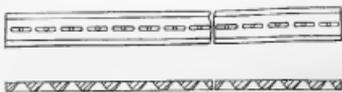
Grantype*; nozzle-plate. Elevation and section. Scale: about quarter size.
